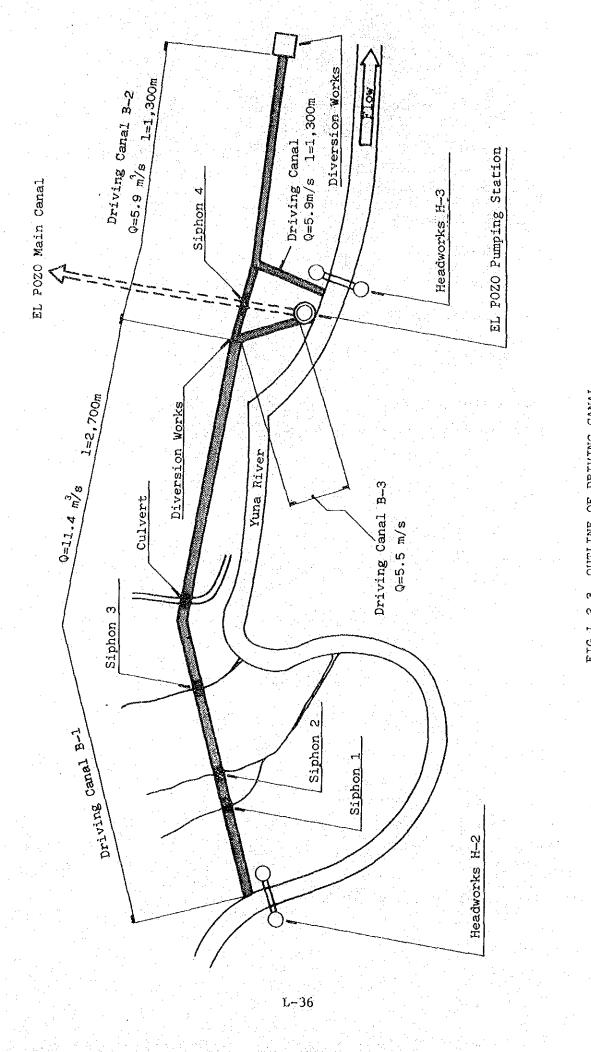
OUTLINE OF DRIVING CANAL
